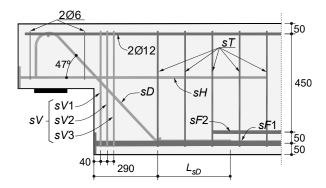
Reinforcement notation and geometry (main reinforcement of the dapped-end in light grey; dimensions in mm).
